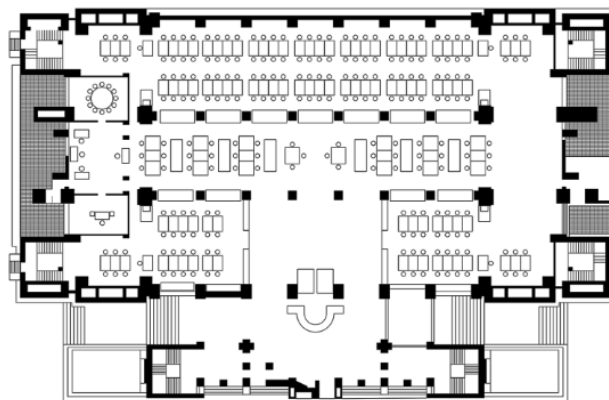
Frank Lloyd Wright Larkin building plan (Gou, 2017)
